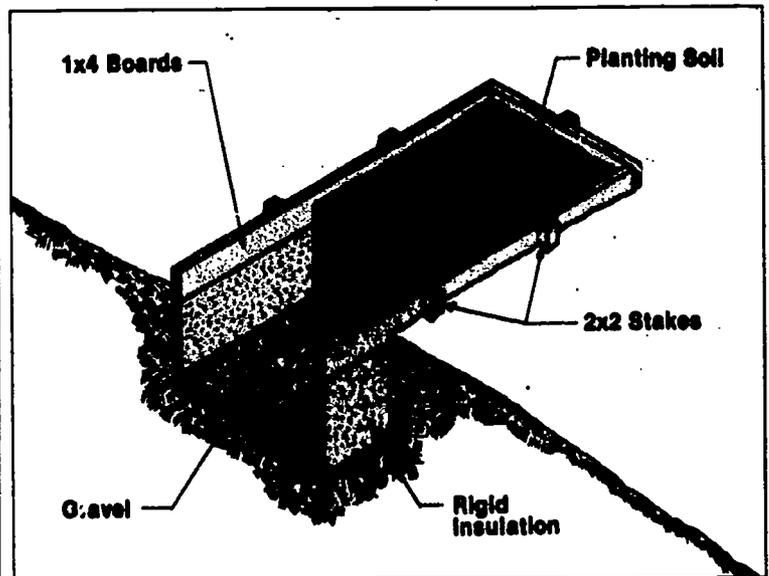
Trough growing beds are a good idea when planting at ground level.
